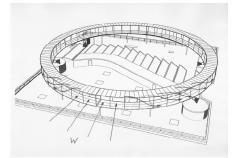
Transfer of wind loads; the wind loads act against the glass walls.
